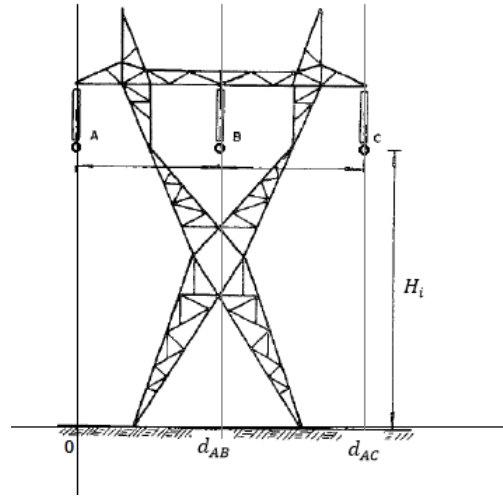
Geometric layout of the phases in the tower. Adapted from [19]
